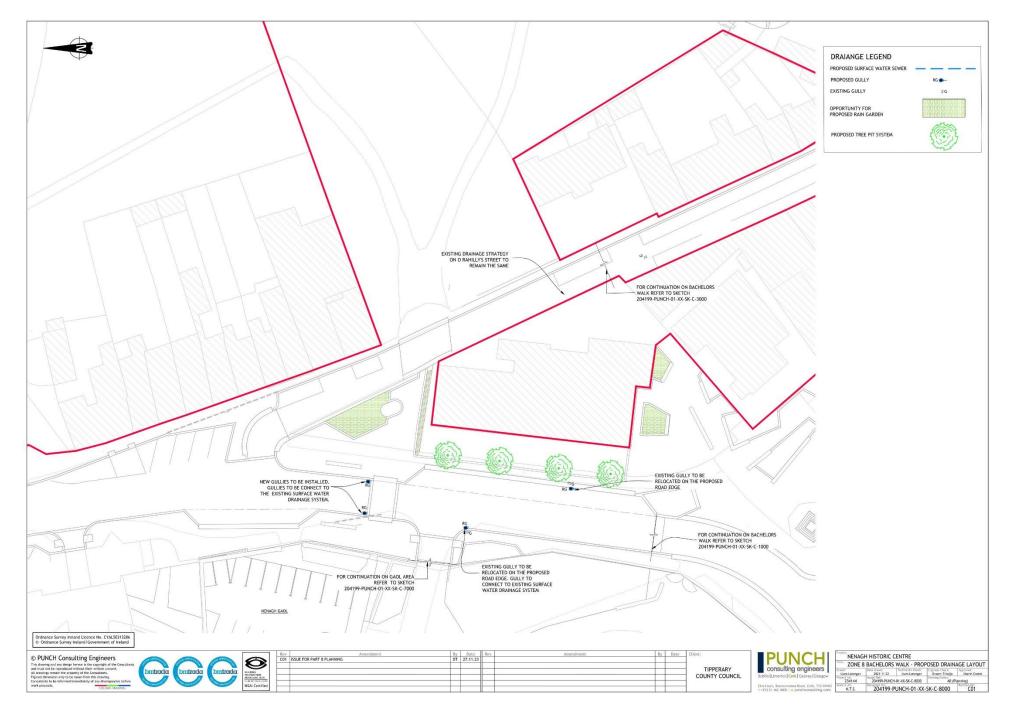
Proposed Stormwater O'Rahilly Street & Tourist Office/Former Town Hall (NHCQ Zone 8)
